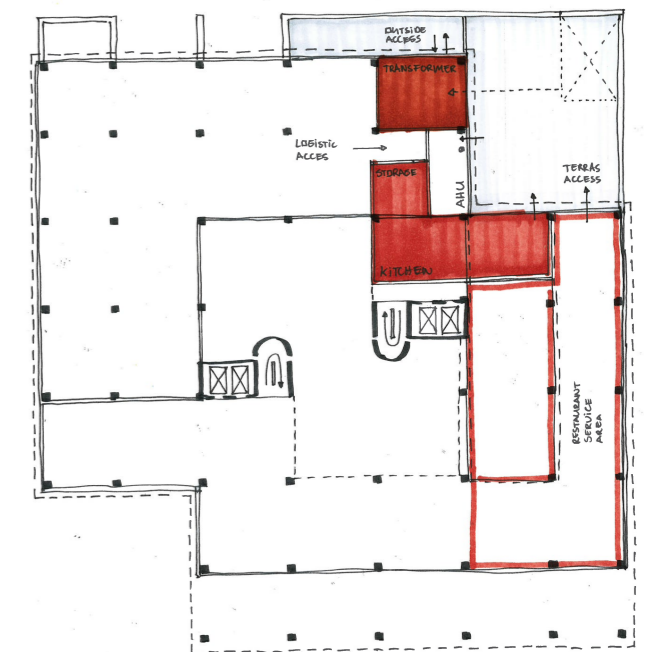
Separate AHU for kitchen, transformer and logistical access in parking garage, access to outdoor area and terrace (Lars Haga, 2026)
